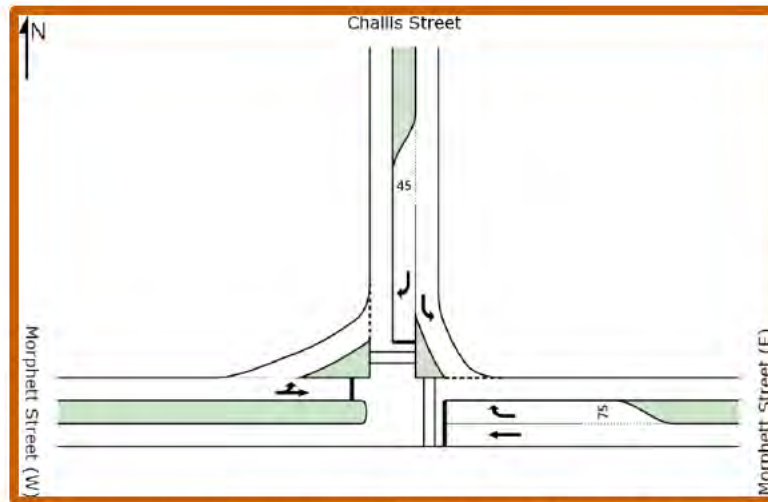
Recommended Layout for the Intersection of Morphett Street and Challis Street
